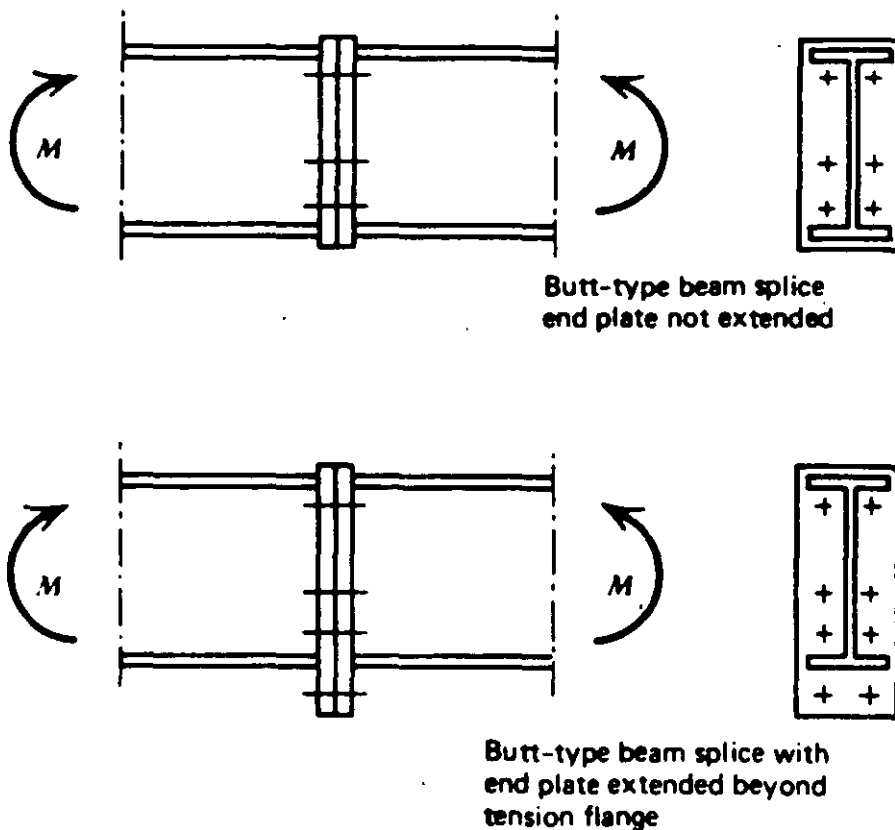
End-plate types. *Note.* Connect end plates to beams with enough weld to develop full bending strength of beam.
